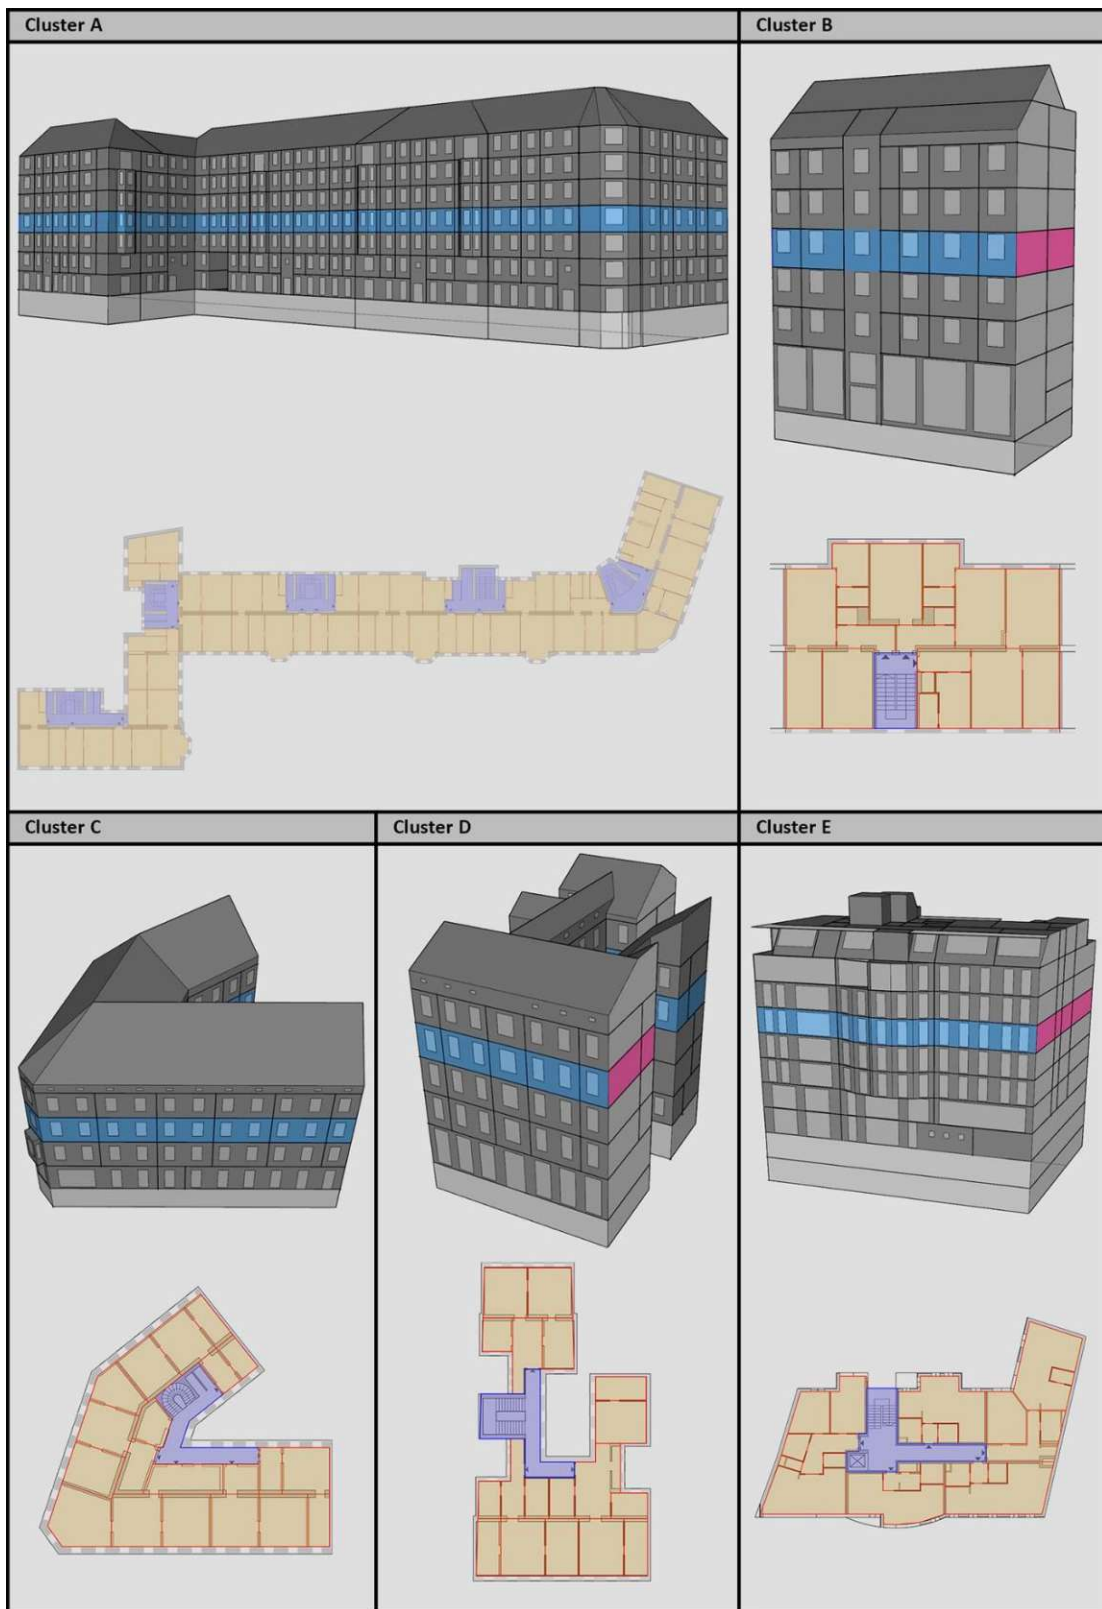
Perspective outside view of each building with floor plan of one typical storey. Source: Own illustration, Top illustration: SketchUp with OpenStudio, bottom illustration: AutoCAD
